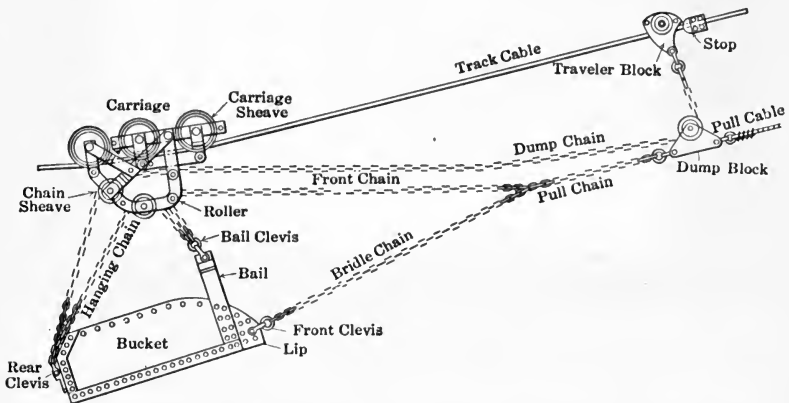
Shearer and Mayer drag-line cableway bucket.
